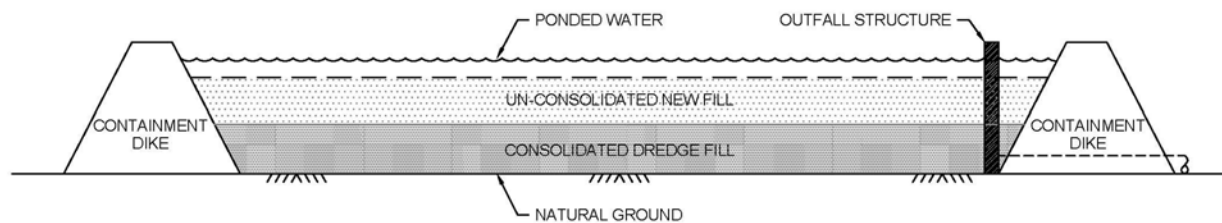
Typical Section of Hydraulic Fill at an Existing UCPA
